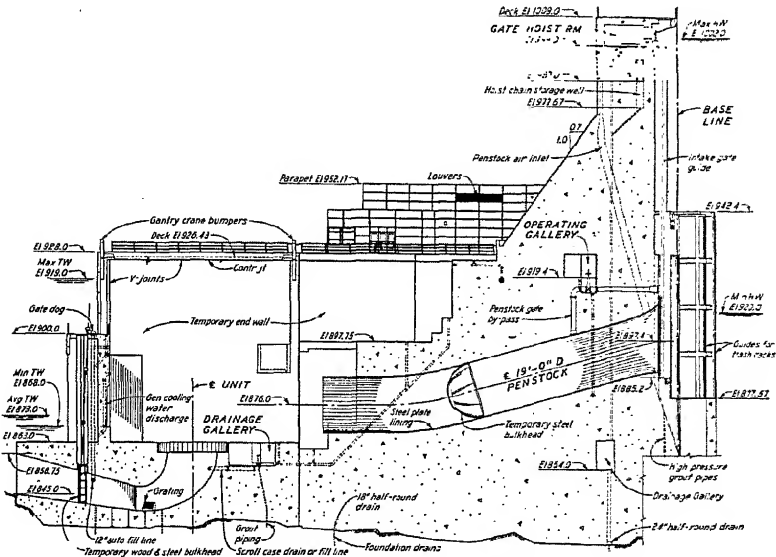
Section through powerhouse showing provisions for future unit 4.
